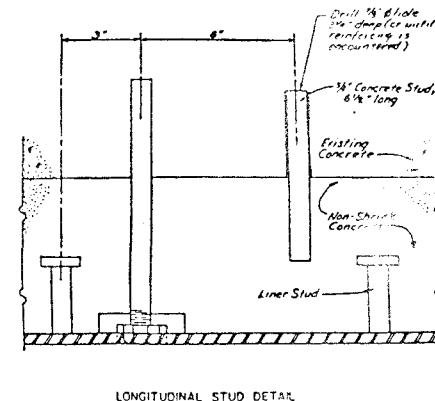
Anchor details for steel liner and nonshrink concrete fill, Eau Galle Dam
